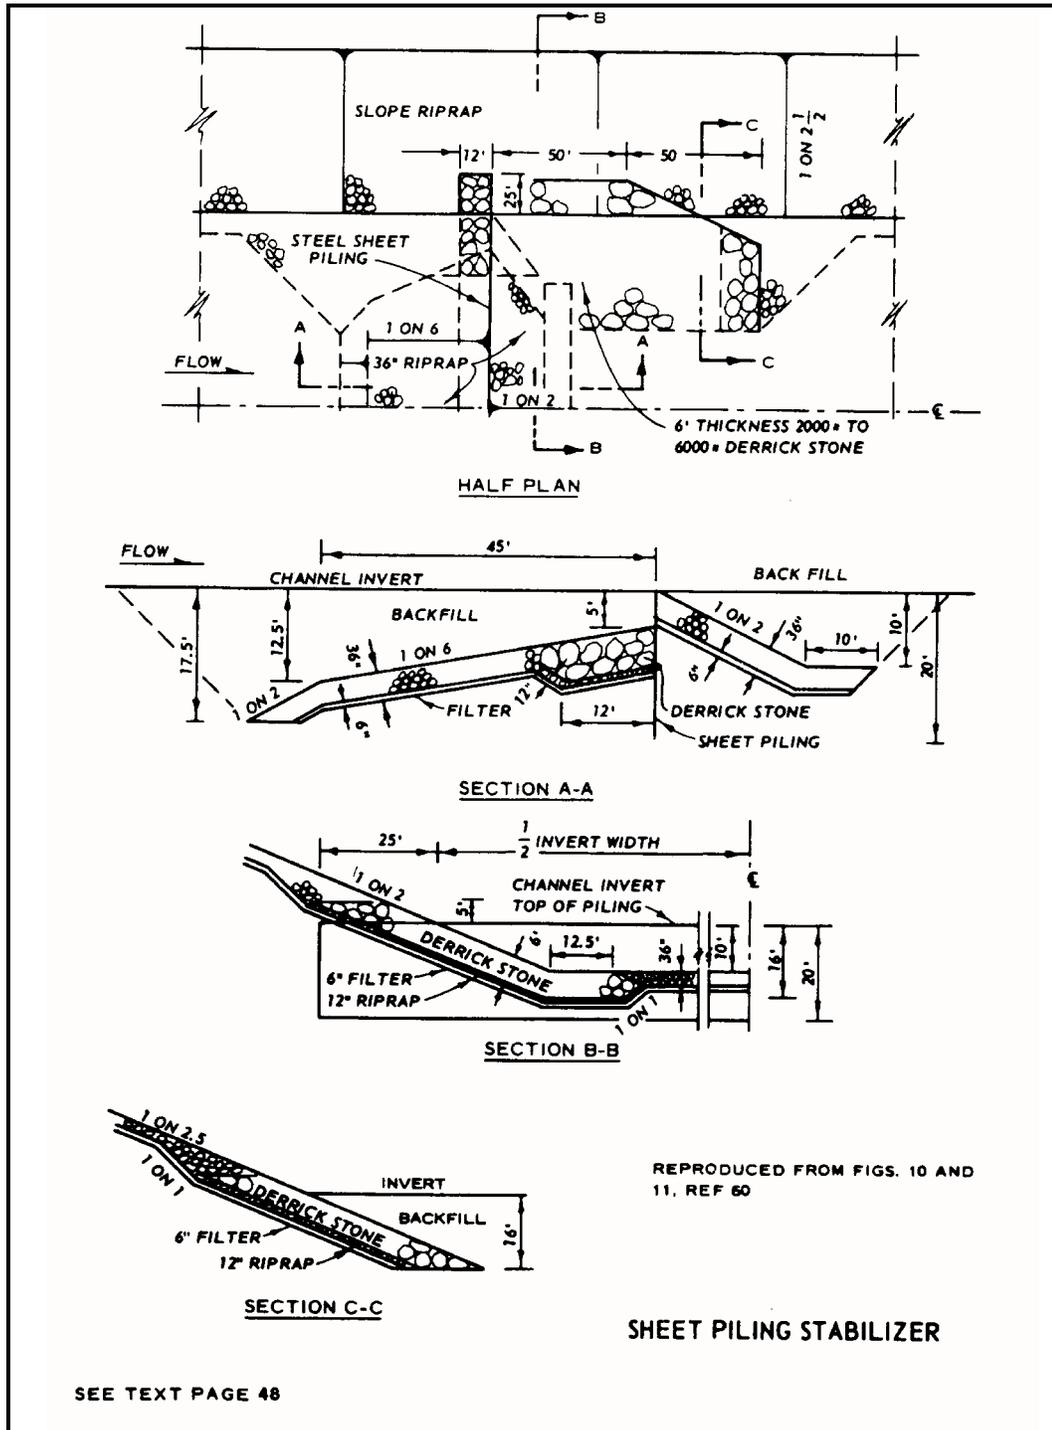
Bed Stabilizer Design with Sheet Pile Cutoff (U.S. Army Corps of Engineers, 1970)
